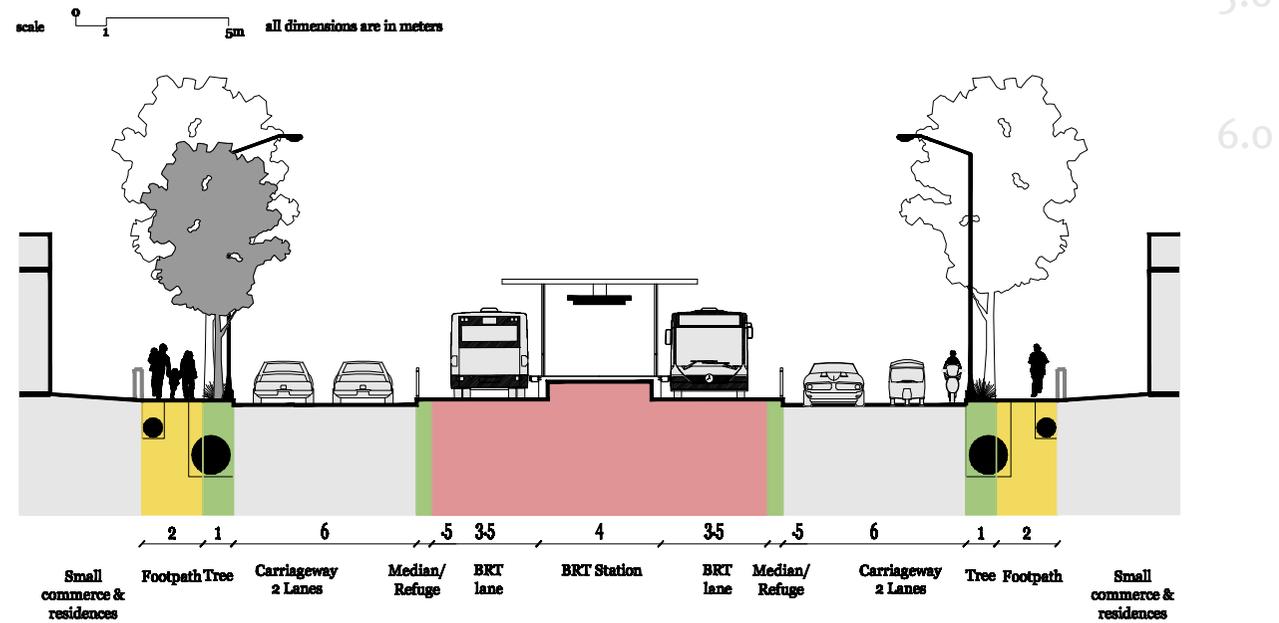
Section through BRT station for typical design for BRT corridors with 30 M ROW
